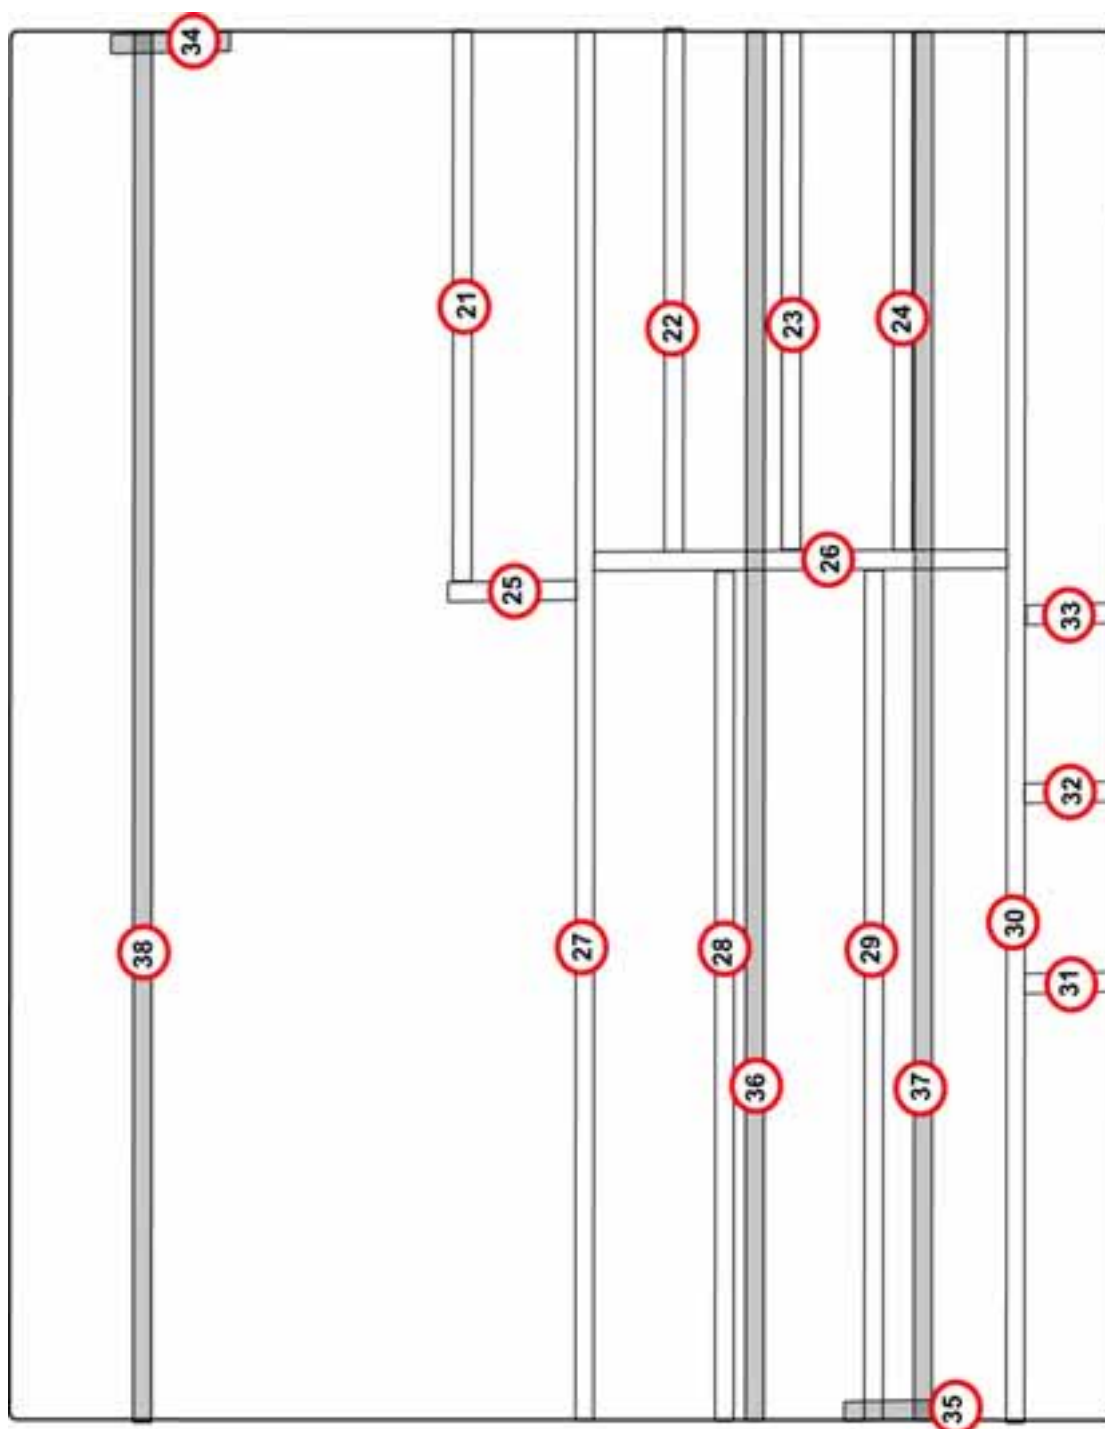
Plan of the second floor of the malthouse to show sampled timbers (inserted steel joists shown shaded)
